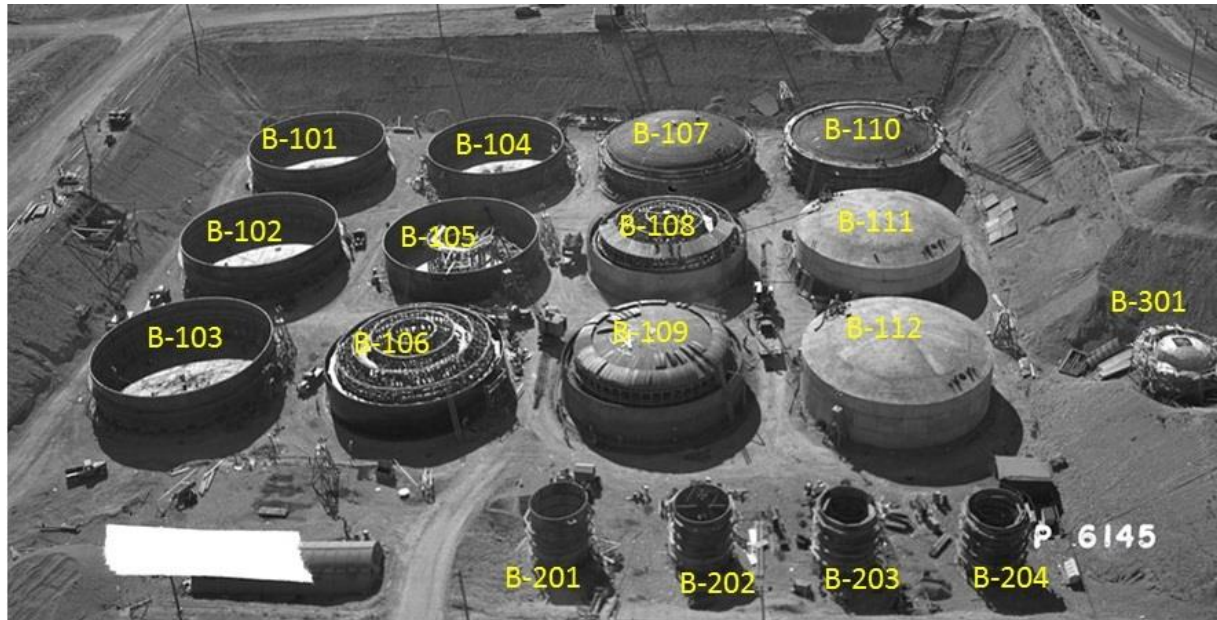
Typical Single-Shell Tank Farm Construction B Tank Farm (RPP-PLAN-60765)
